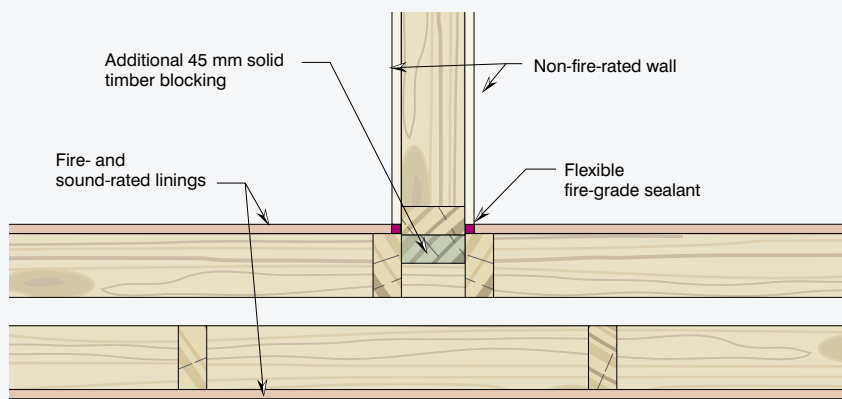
Non-fire-rated wall abutting 60 minutes fire-rated walls using timber blocks – plan view.
